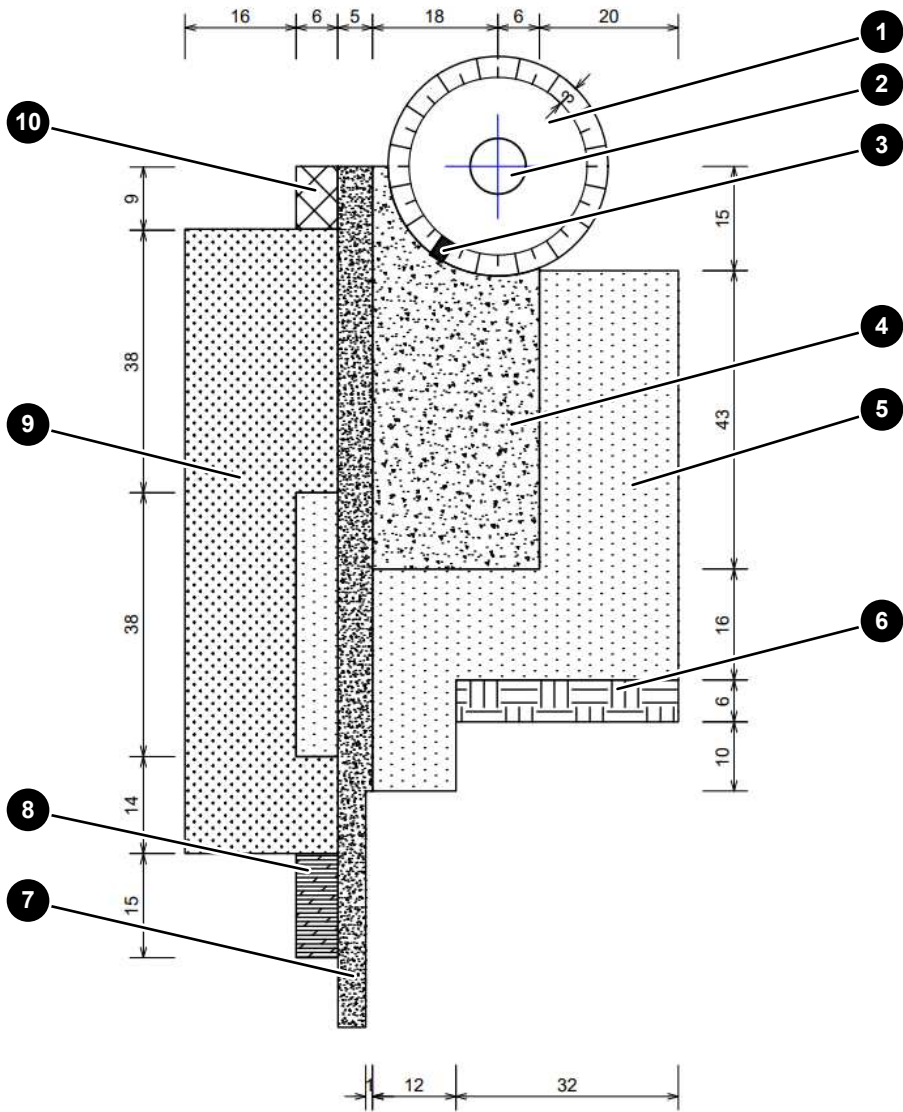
Alternative working area at the WEC site, dimensions (all dimensions in metres)
